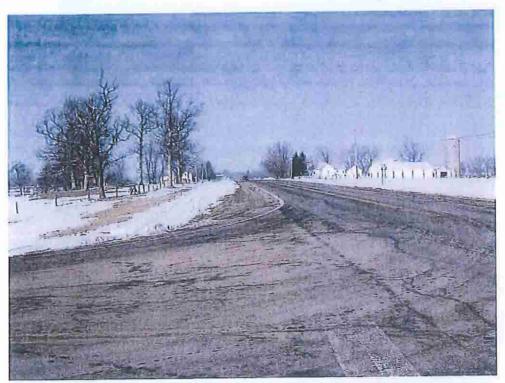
Supplement to Figure 4: Intersection S.R.56 & S.R.29 (Facing West)
